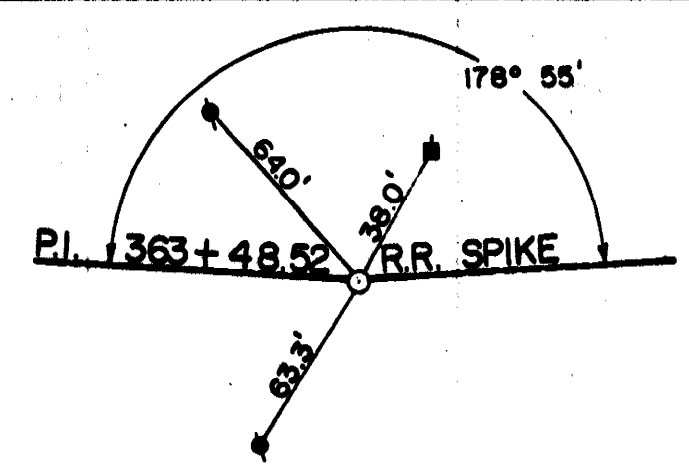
PLAN PROFILE & P.R. STANDARD
